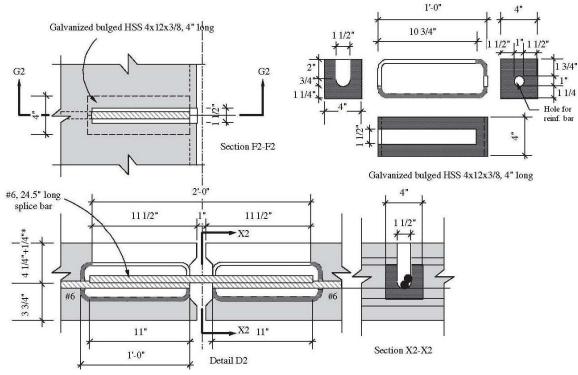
Blind Pocket and Bar Slot Connection Details (source: NCHRP Report 584 [9])
